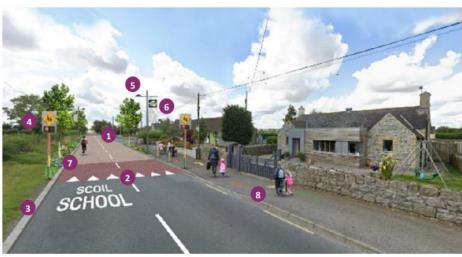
Recommended School Zone Layout (SRTS, 2020)
